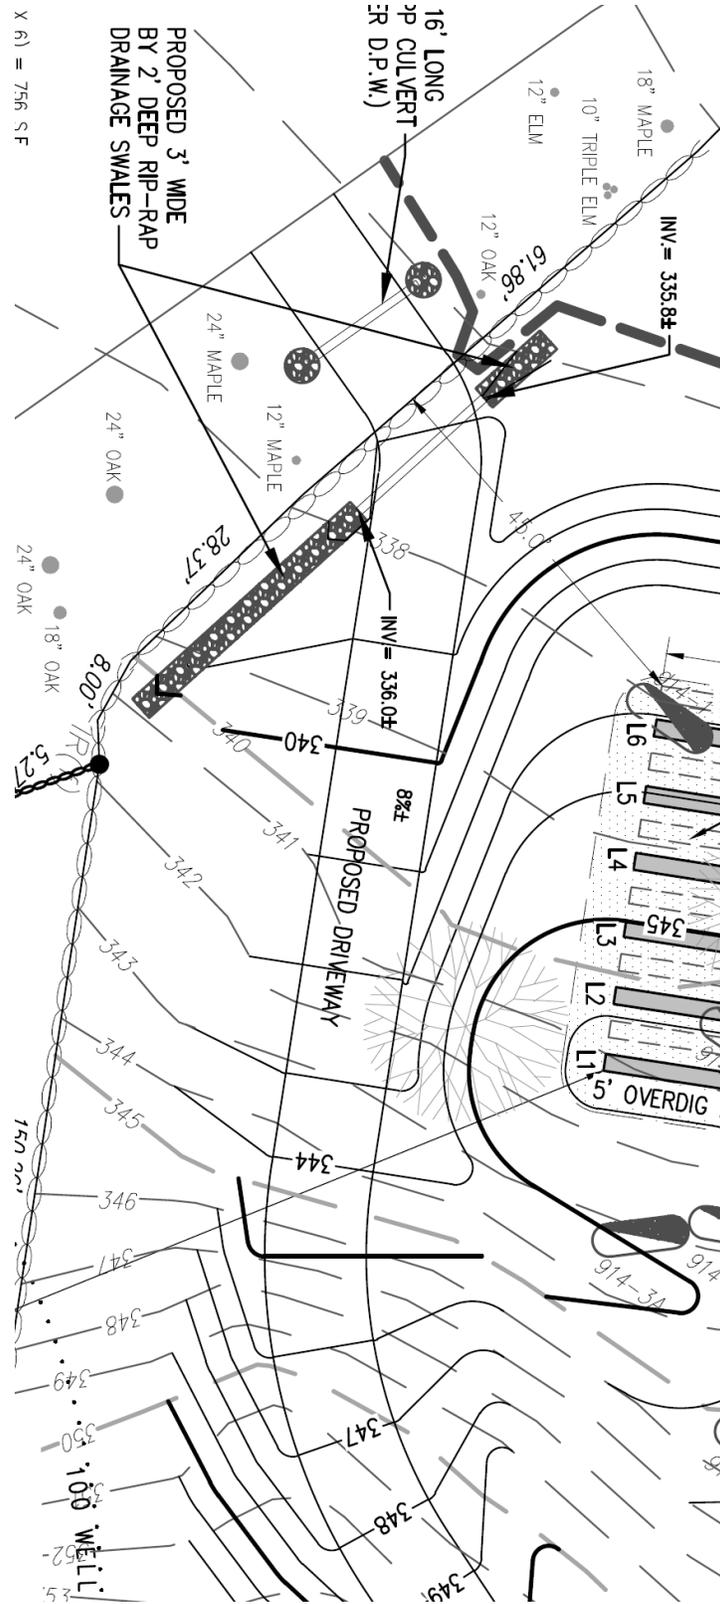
Closeup of Driveway Showing Slope of first 50 feet of Driveway
